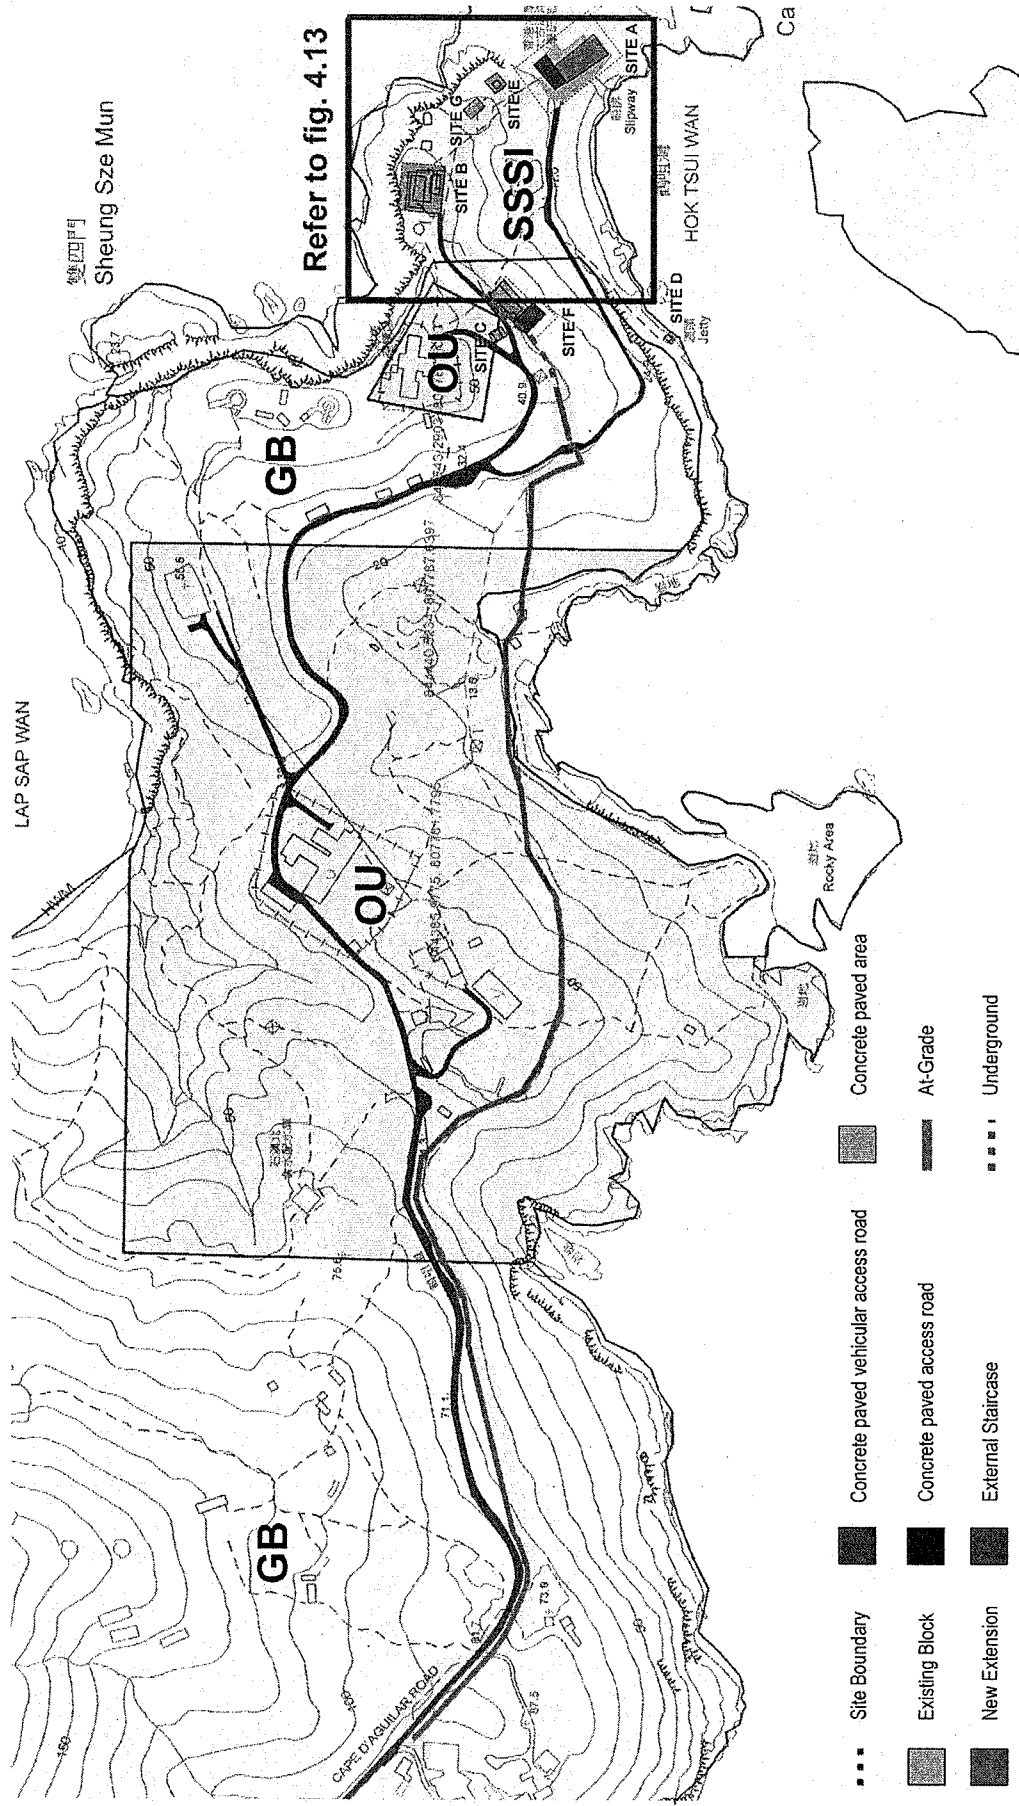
Layout Plan Describing the Proposed At-grade and Underneath Concrete Paved Area Arrangement of Fire Services Water Pipe with Alignment
